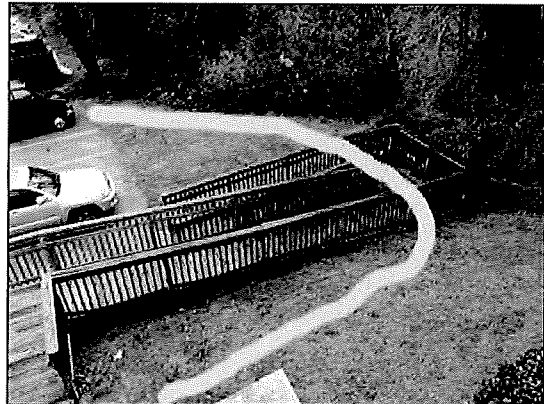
A concrete sidewalk at the approximate location shown by the yellow line above, may be more cost effective while providing easier access.
